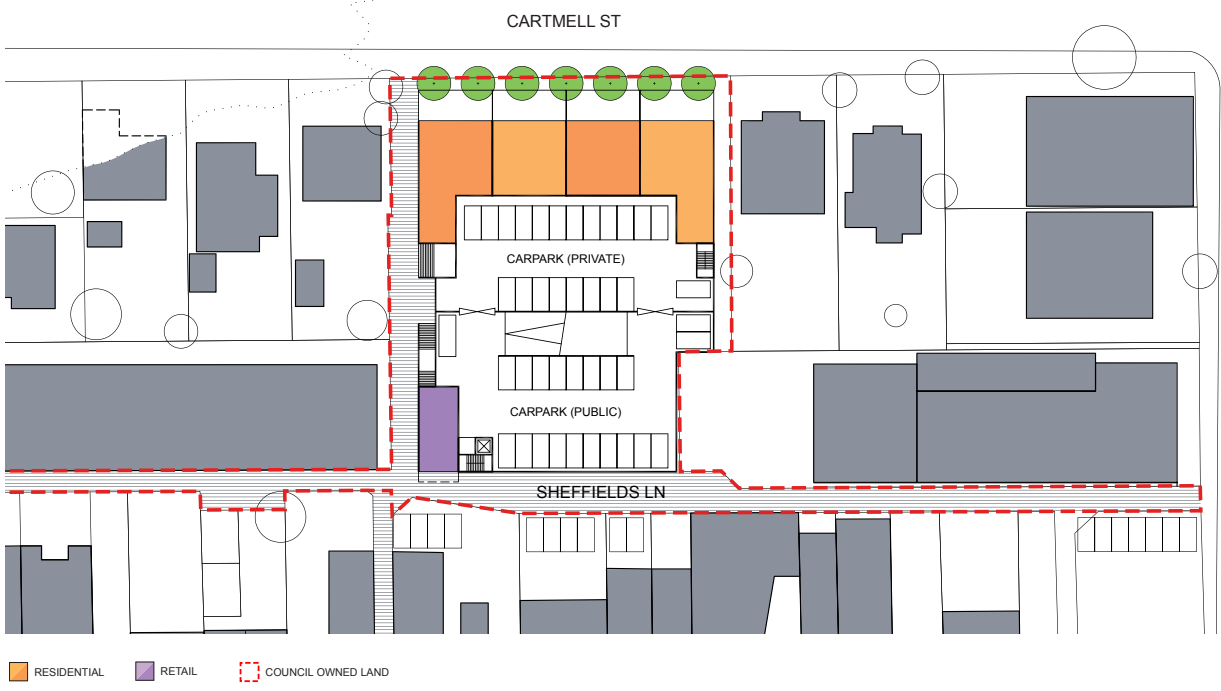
Cartmell Street Site Concept Plan (source: Car Park Sites Study, 2010)
